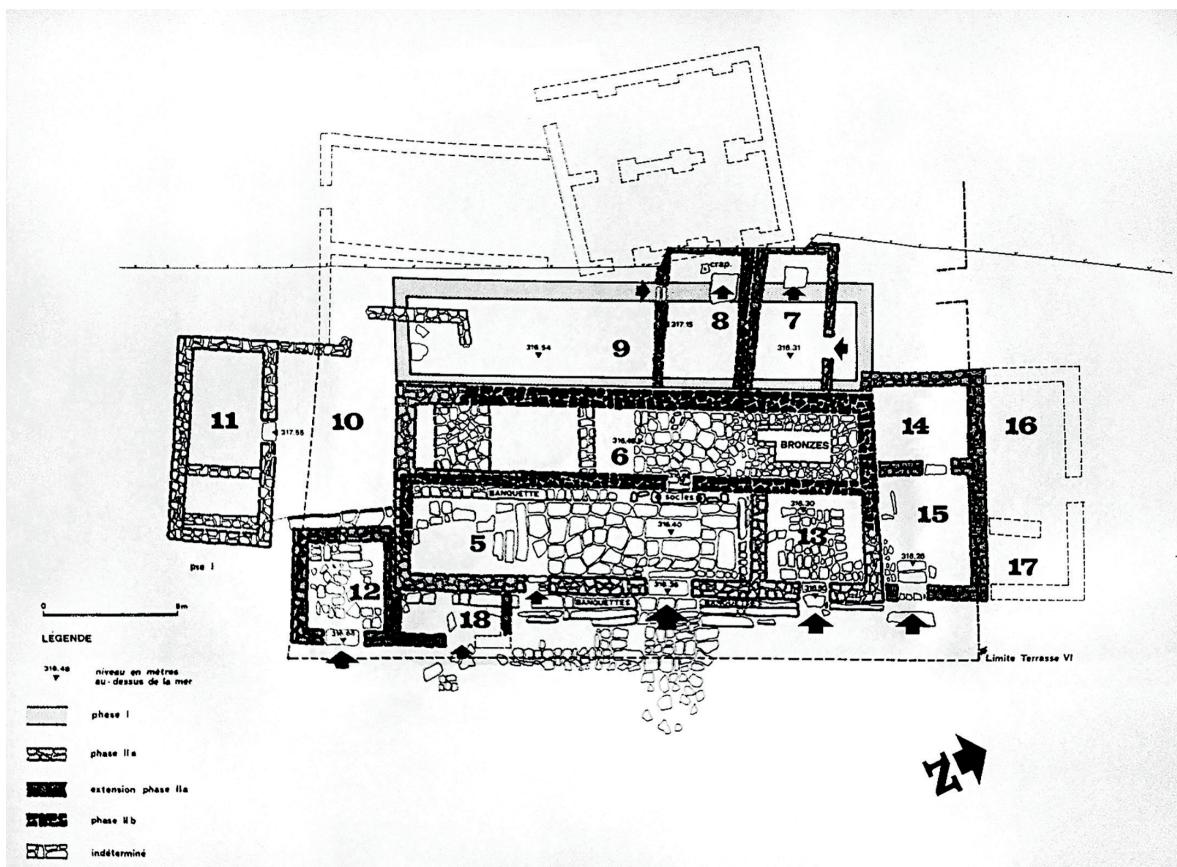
Plan of the Building C, the so-called “Temple of Heracles”
